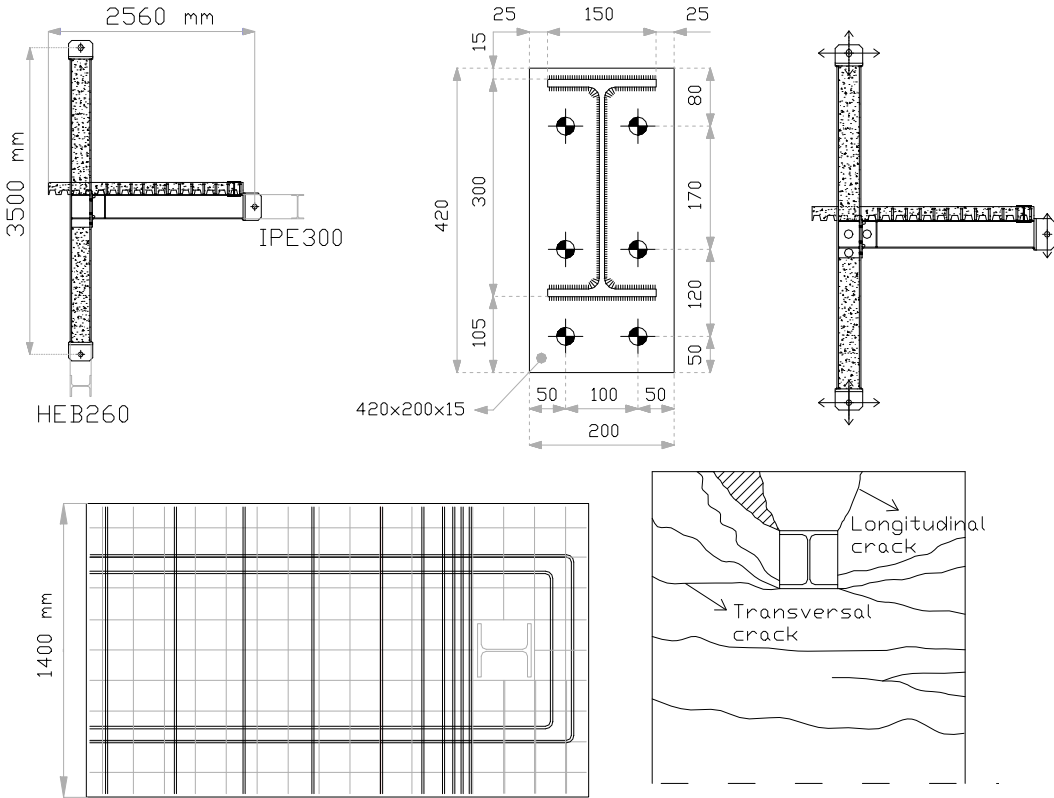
Tested joint configuration and cracks in the concrete slab at the end of the test
